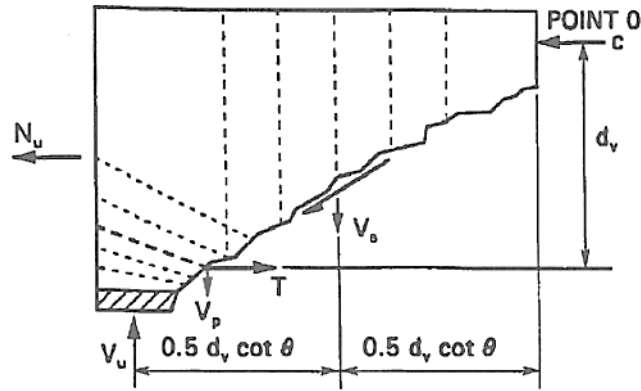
Internal forces at a diagonally cracked section (AASHTO LRFD, 2007)
